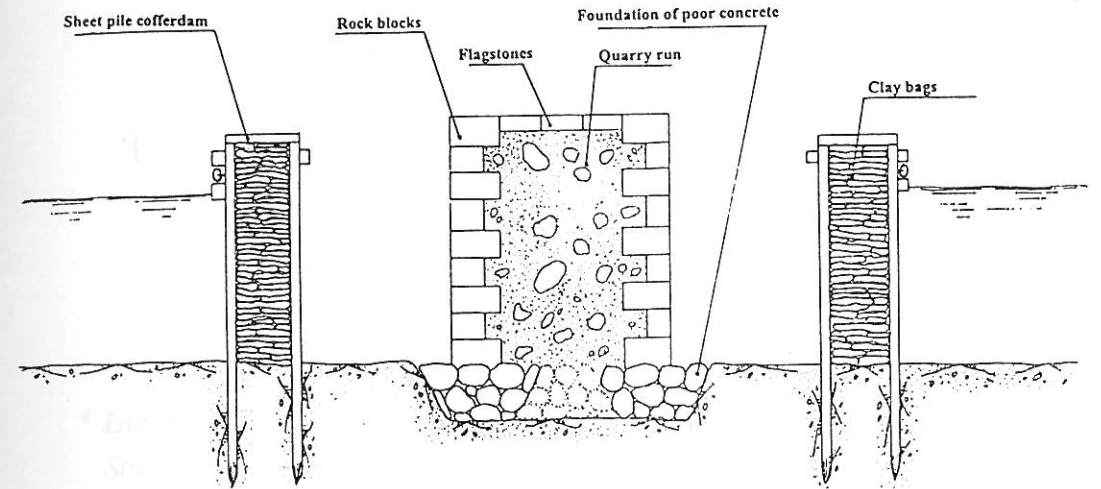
Cross-section of vertical breakwater of rock blocks wall when ground bottom was good (de la Peña, Prada & Redondo '95, according to Vitruvio (5-13))
